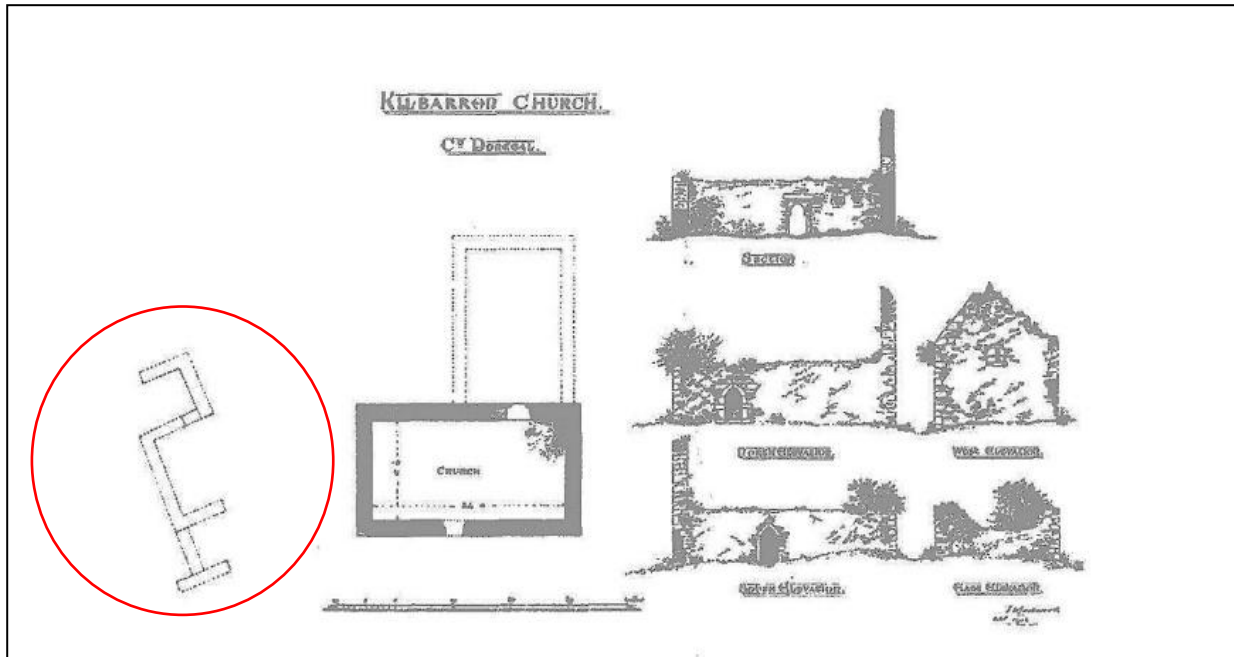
Plan and elevation drawings of Kilbarron church (after Lockwood 1903, 115).
